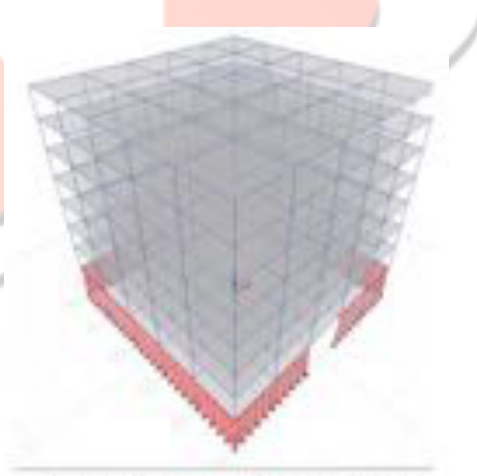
D Elevation of 8 Storey Building (Model 1)
